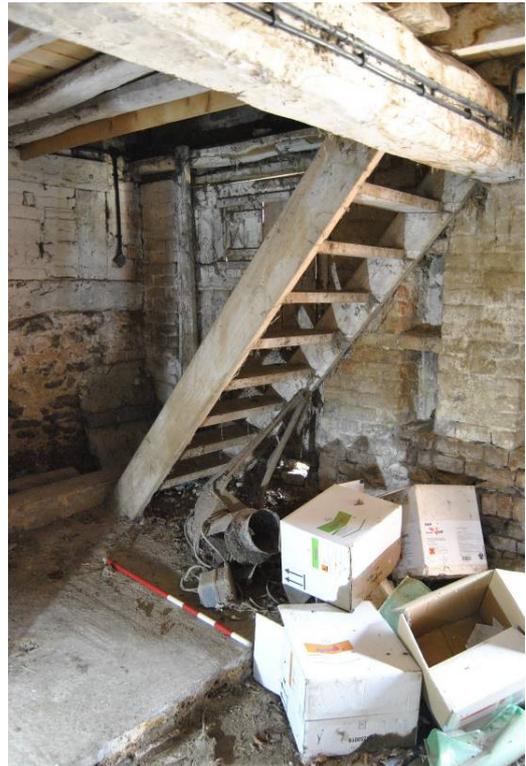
Straight-flight stair rises to loft level at south-west corner.
